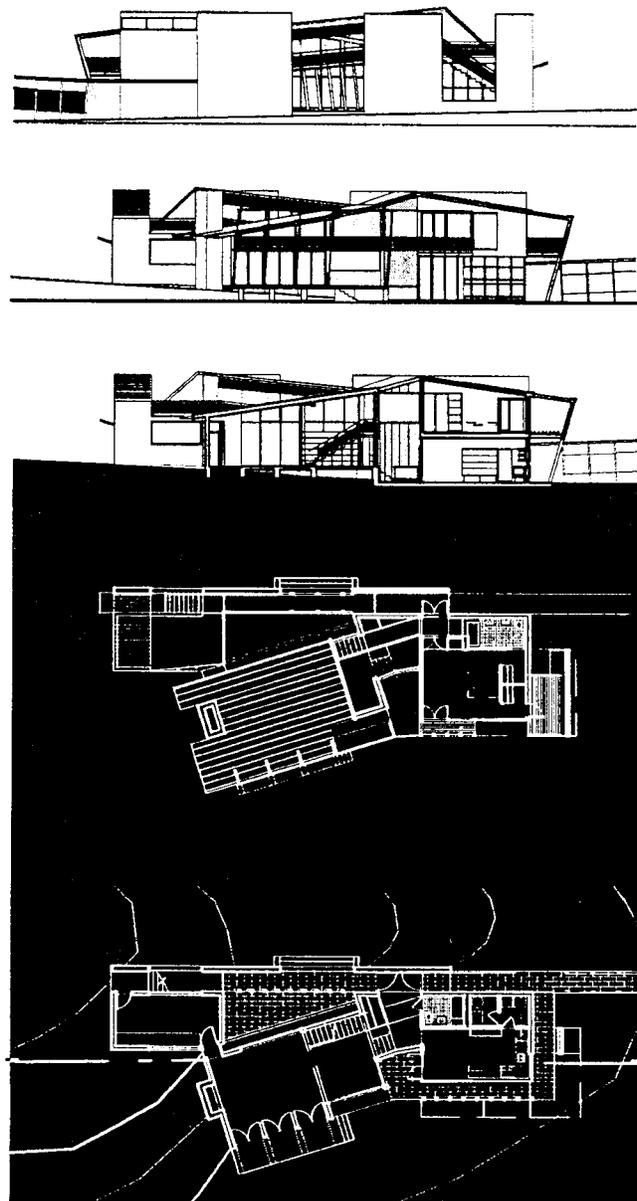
From top: North elevation; South elevation; 2nd floor plan; and 1st floor plan.
